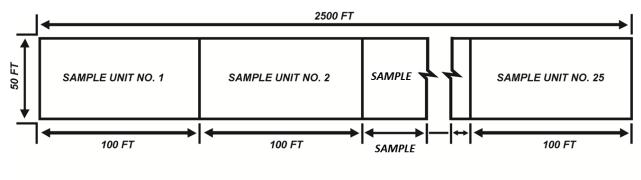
Example Division of a Flexible Pavement Section into Sample Units
